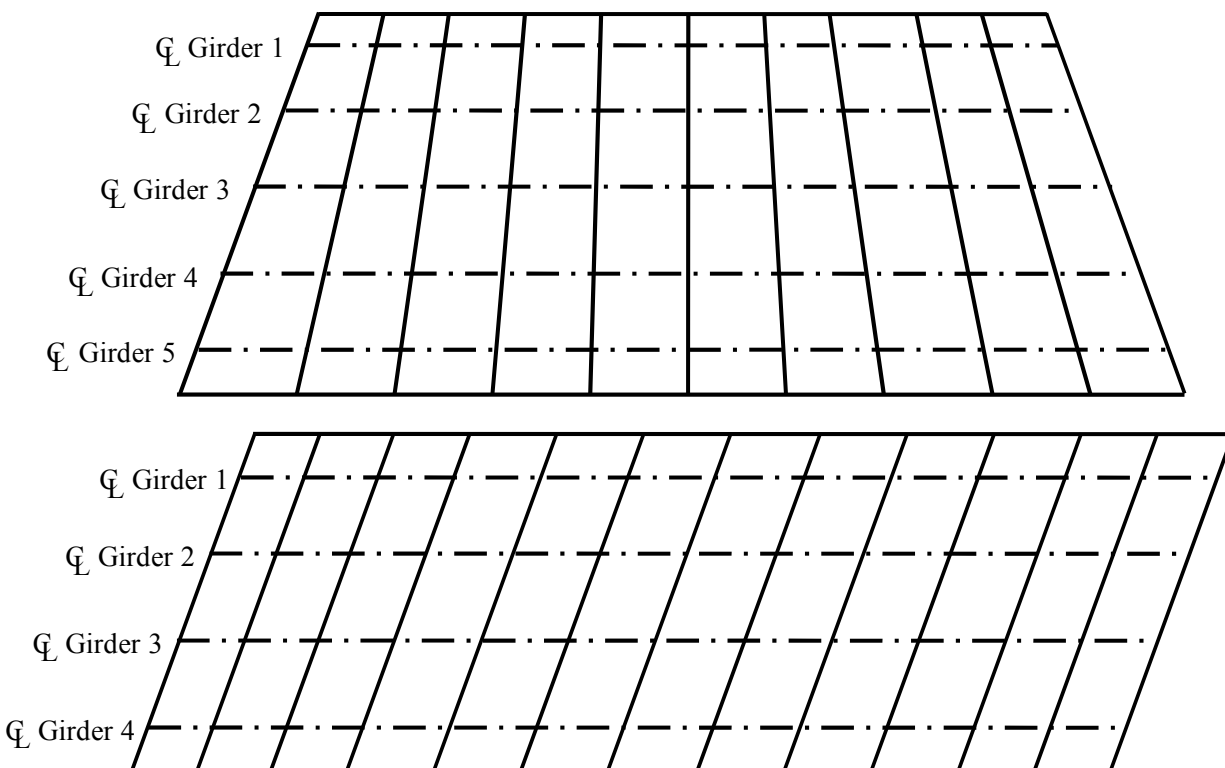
Skewed Bridge Nodal Cross Section Schematic
